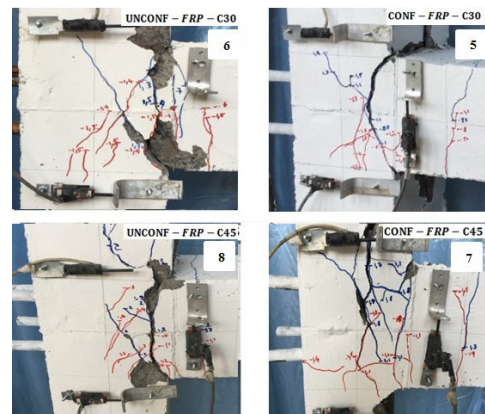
The cracking patterns of specimens reinforced with GFRP bars
